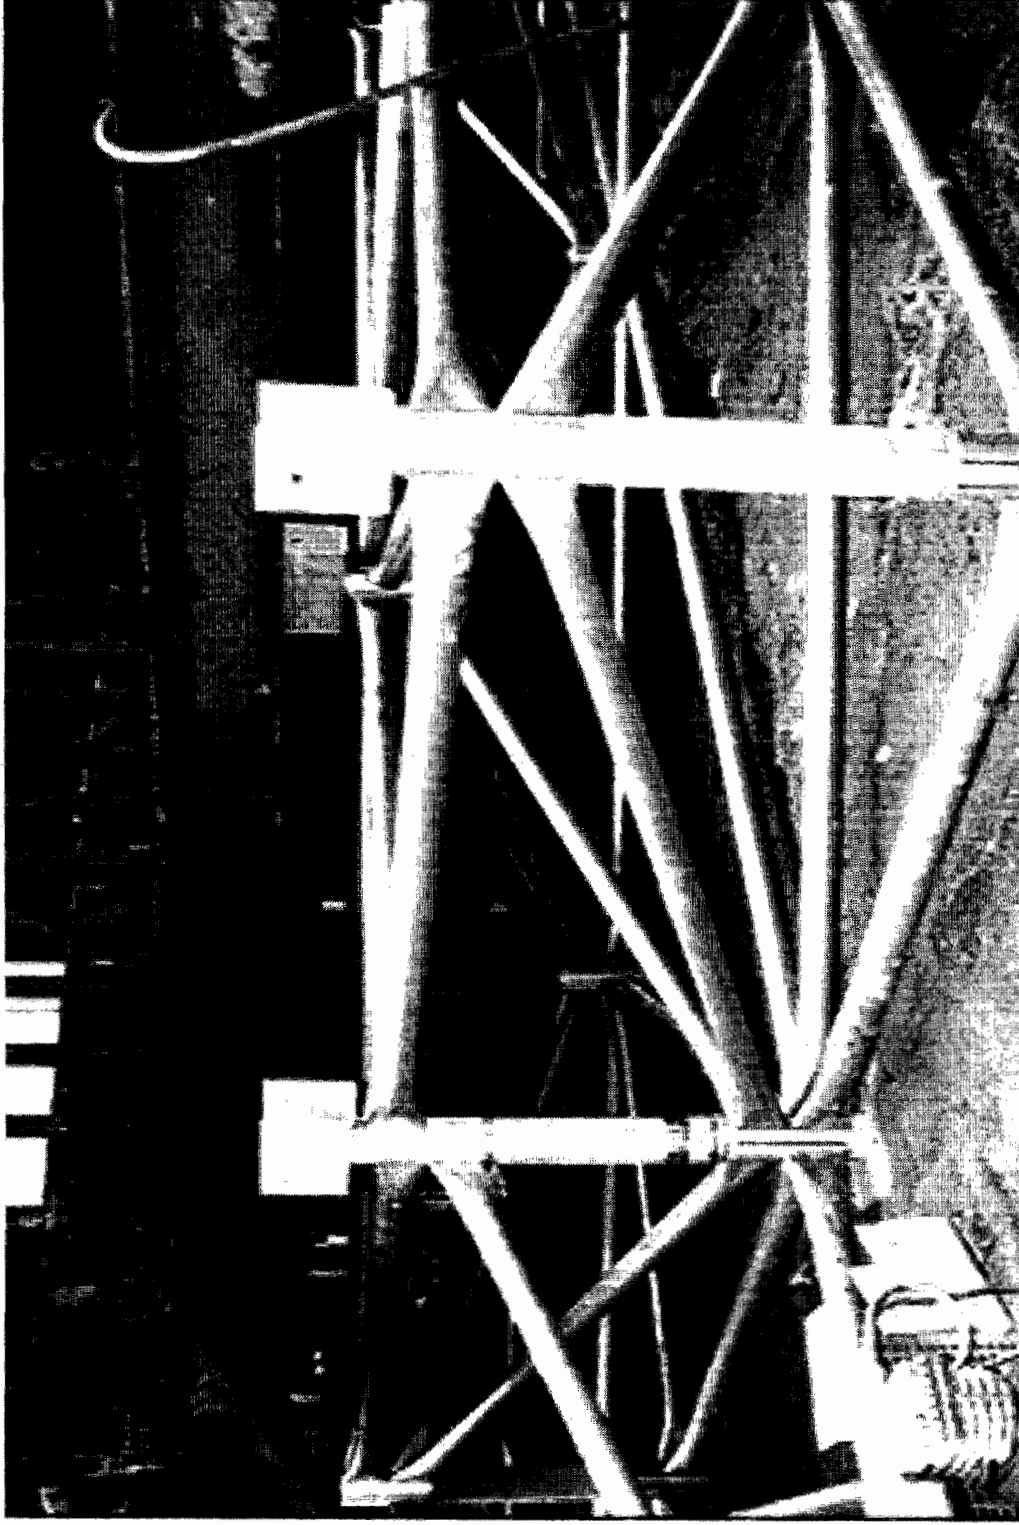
Three dimensional truss-type foundation manufactured by Triodetic Corporation of Canada.
